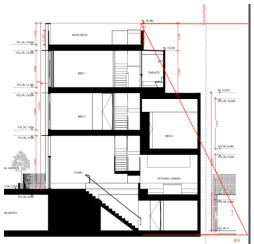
Planning officer mark-up of Section A showing Standard B22 view line from southern roof terraces
